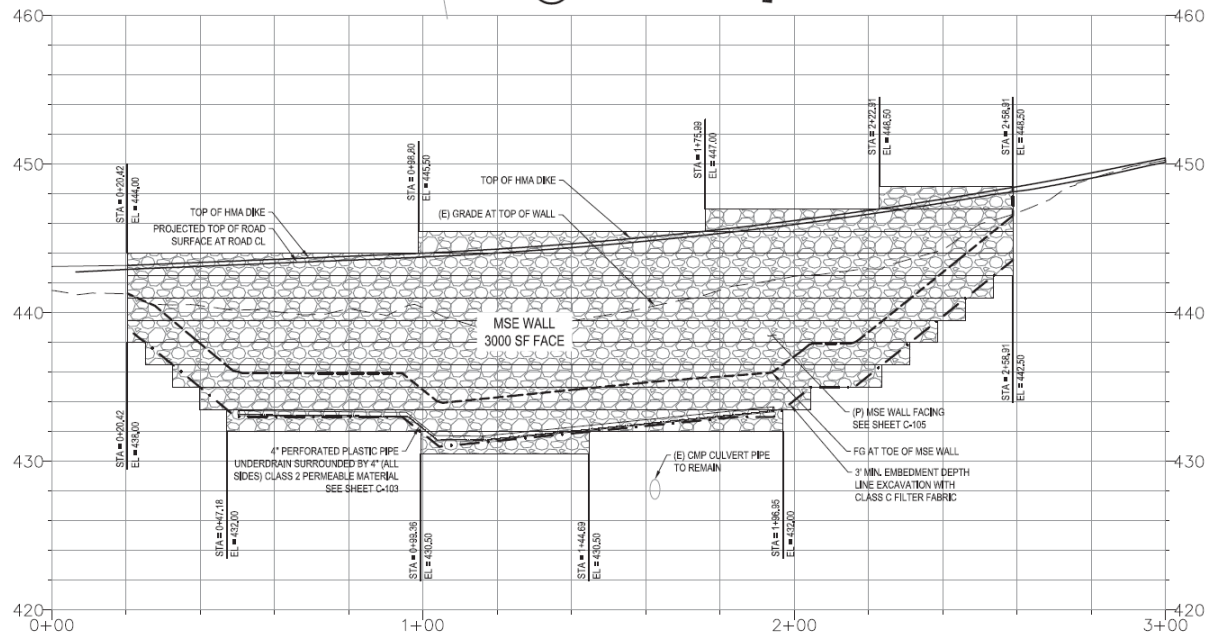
Elevation View of the Wall Height Along the Length of the Road
